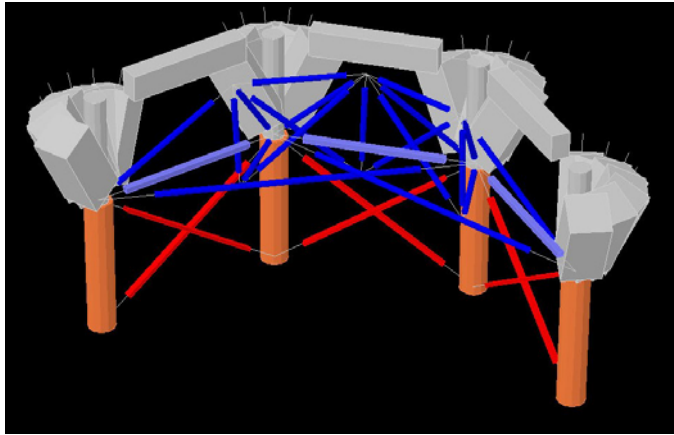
3-D Trusses and Damper Braces (One Quadrant)
